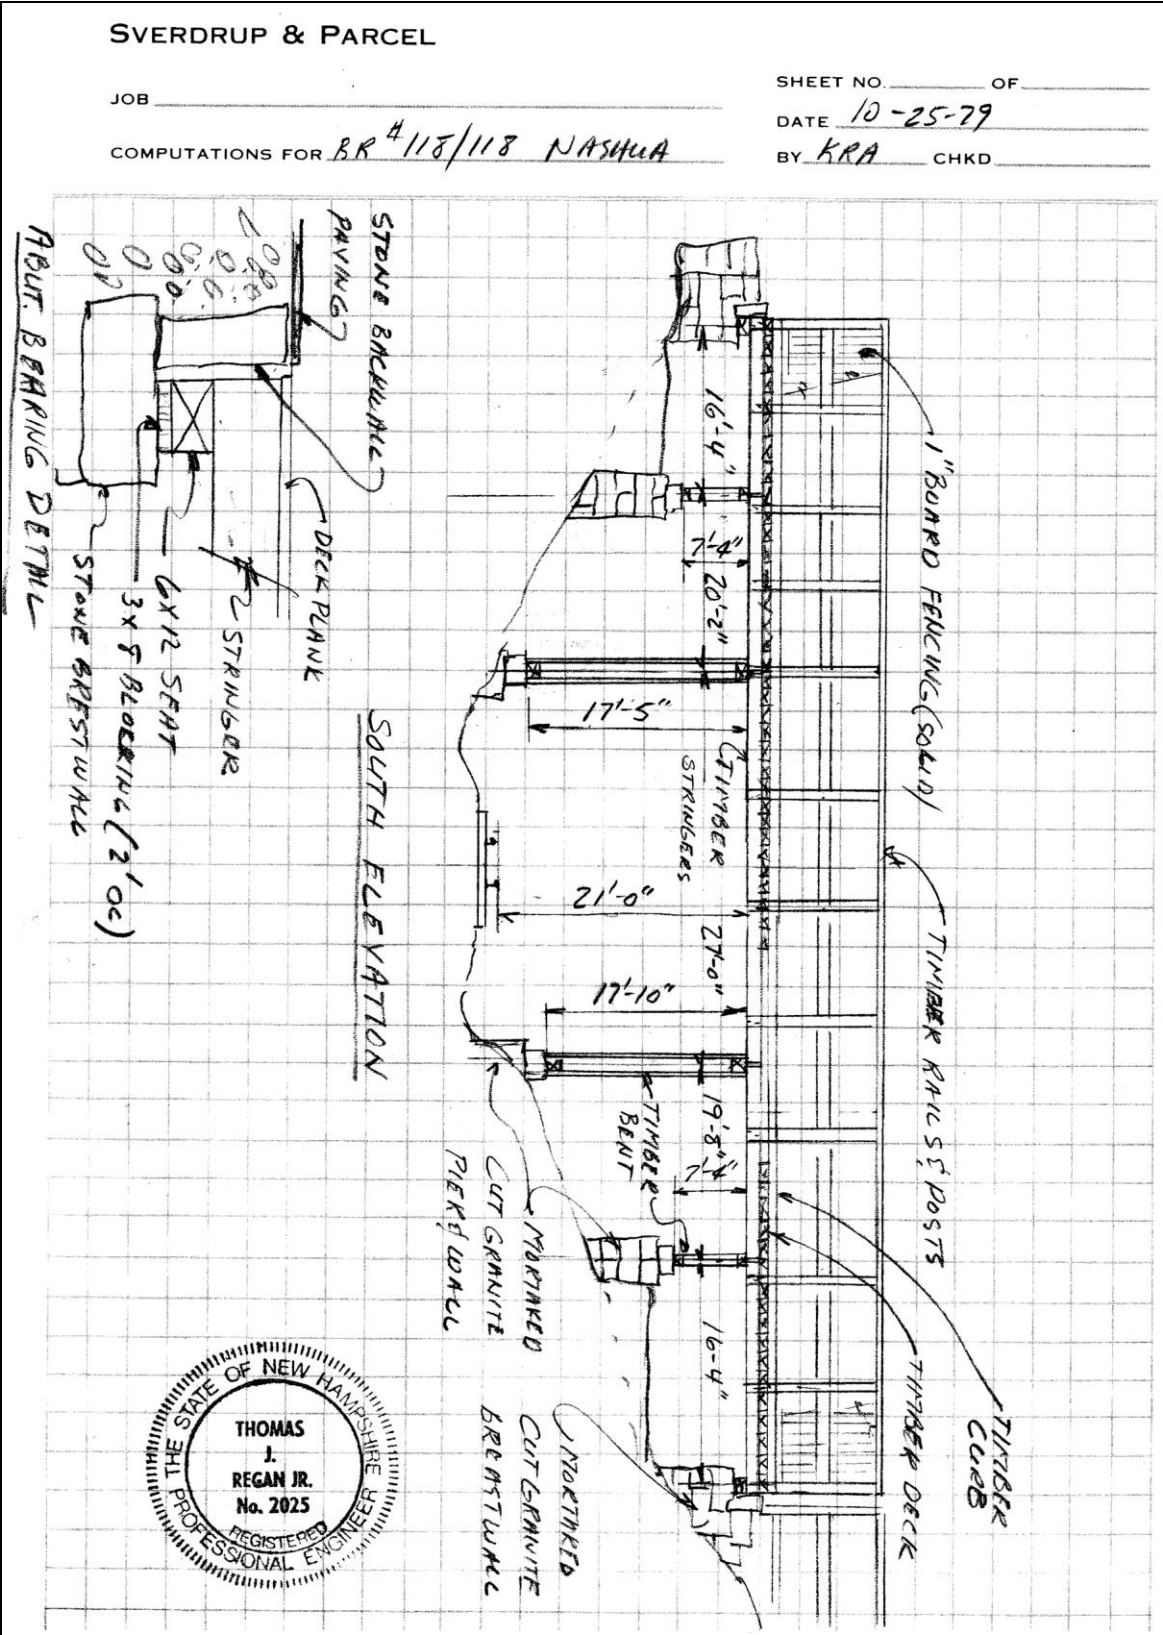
Fairmount St. Bridge Engineering Inspection Sketch by Thomas Regan, Jr. CE, Sverdrup & Parcel Engineers, October 1979 (NHDOT Bridge Inspection File).
